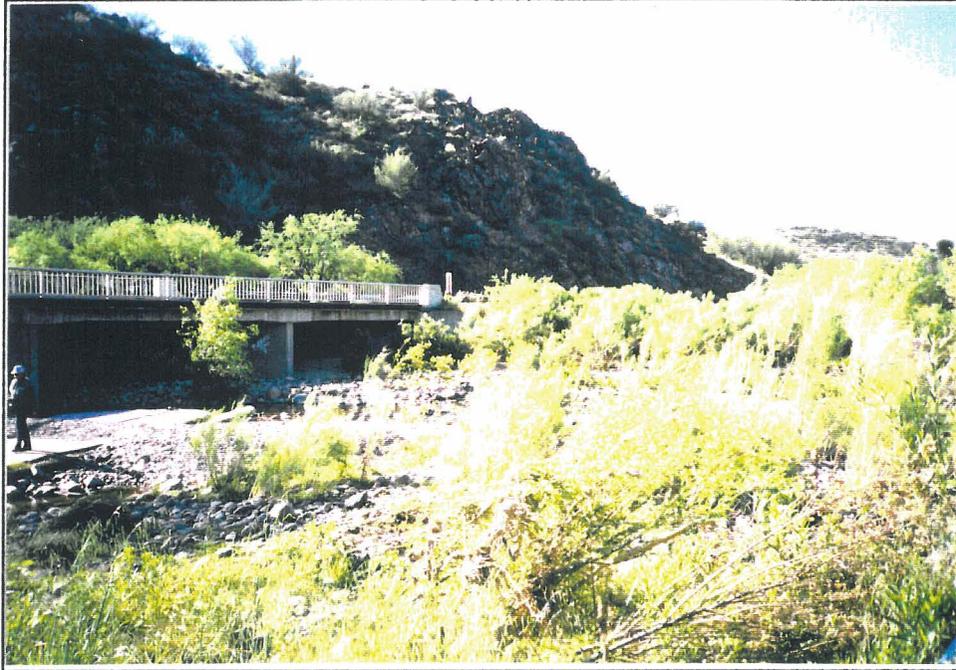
View looking toward downstream side of south abutment. Note cliffs in background indicating potential for near-surface bedrock to provide vertical and lateral stability. Also note mature vegetation in downstream overbanks and in primary channel.
